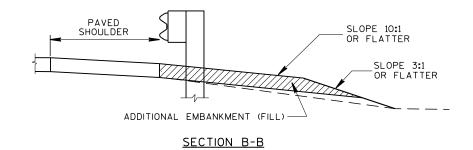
DETAIL FOR SALVAGE AND REINSTALL GUARDRAIL ENERGY ABSORBING TERMINAL
